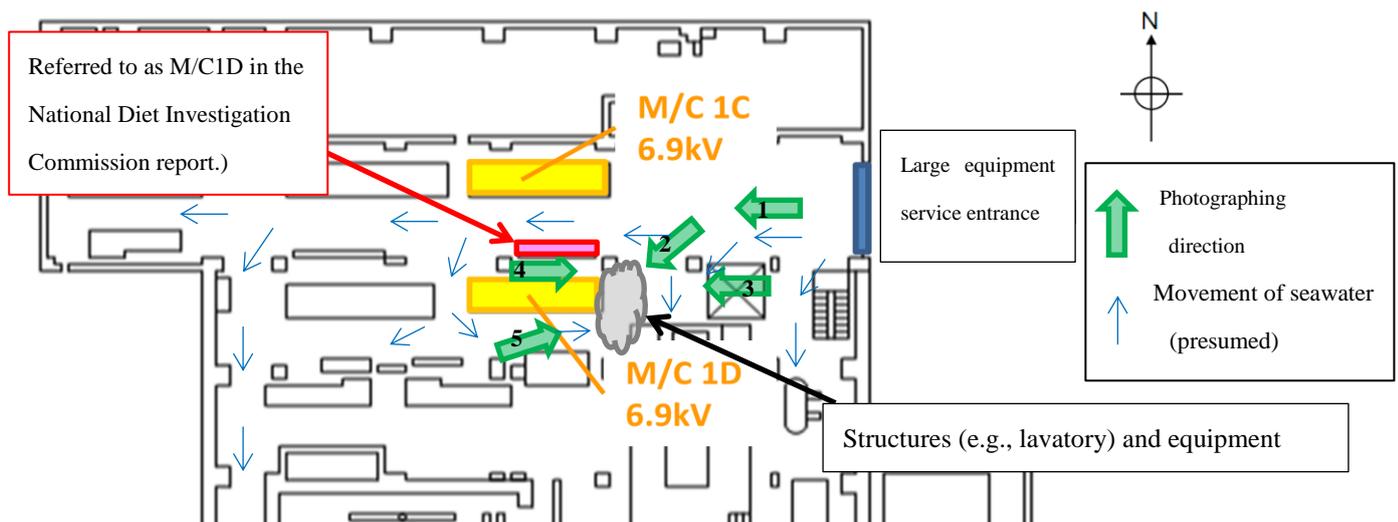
Layout Plan of the Turbine Building's 1st Floor of Unit 1³⁰
